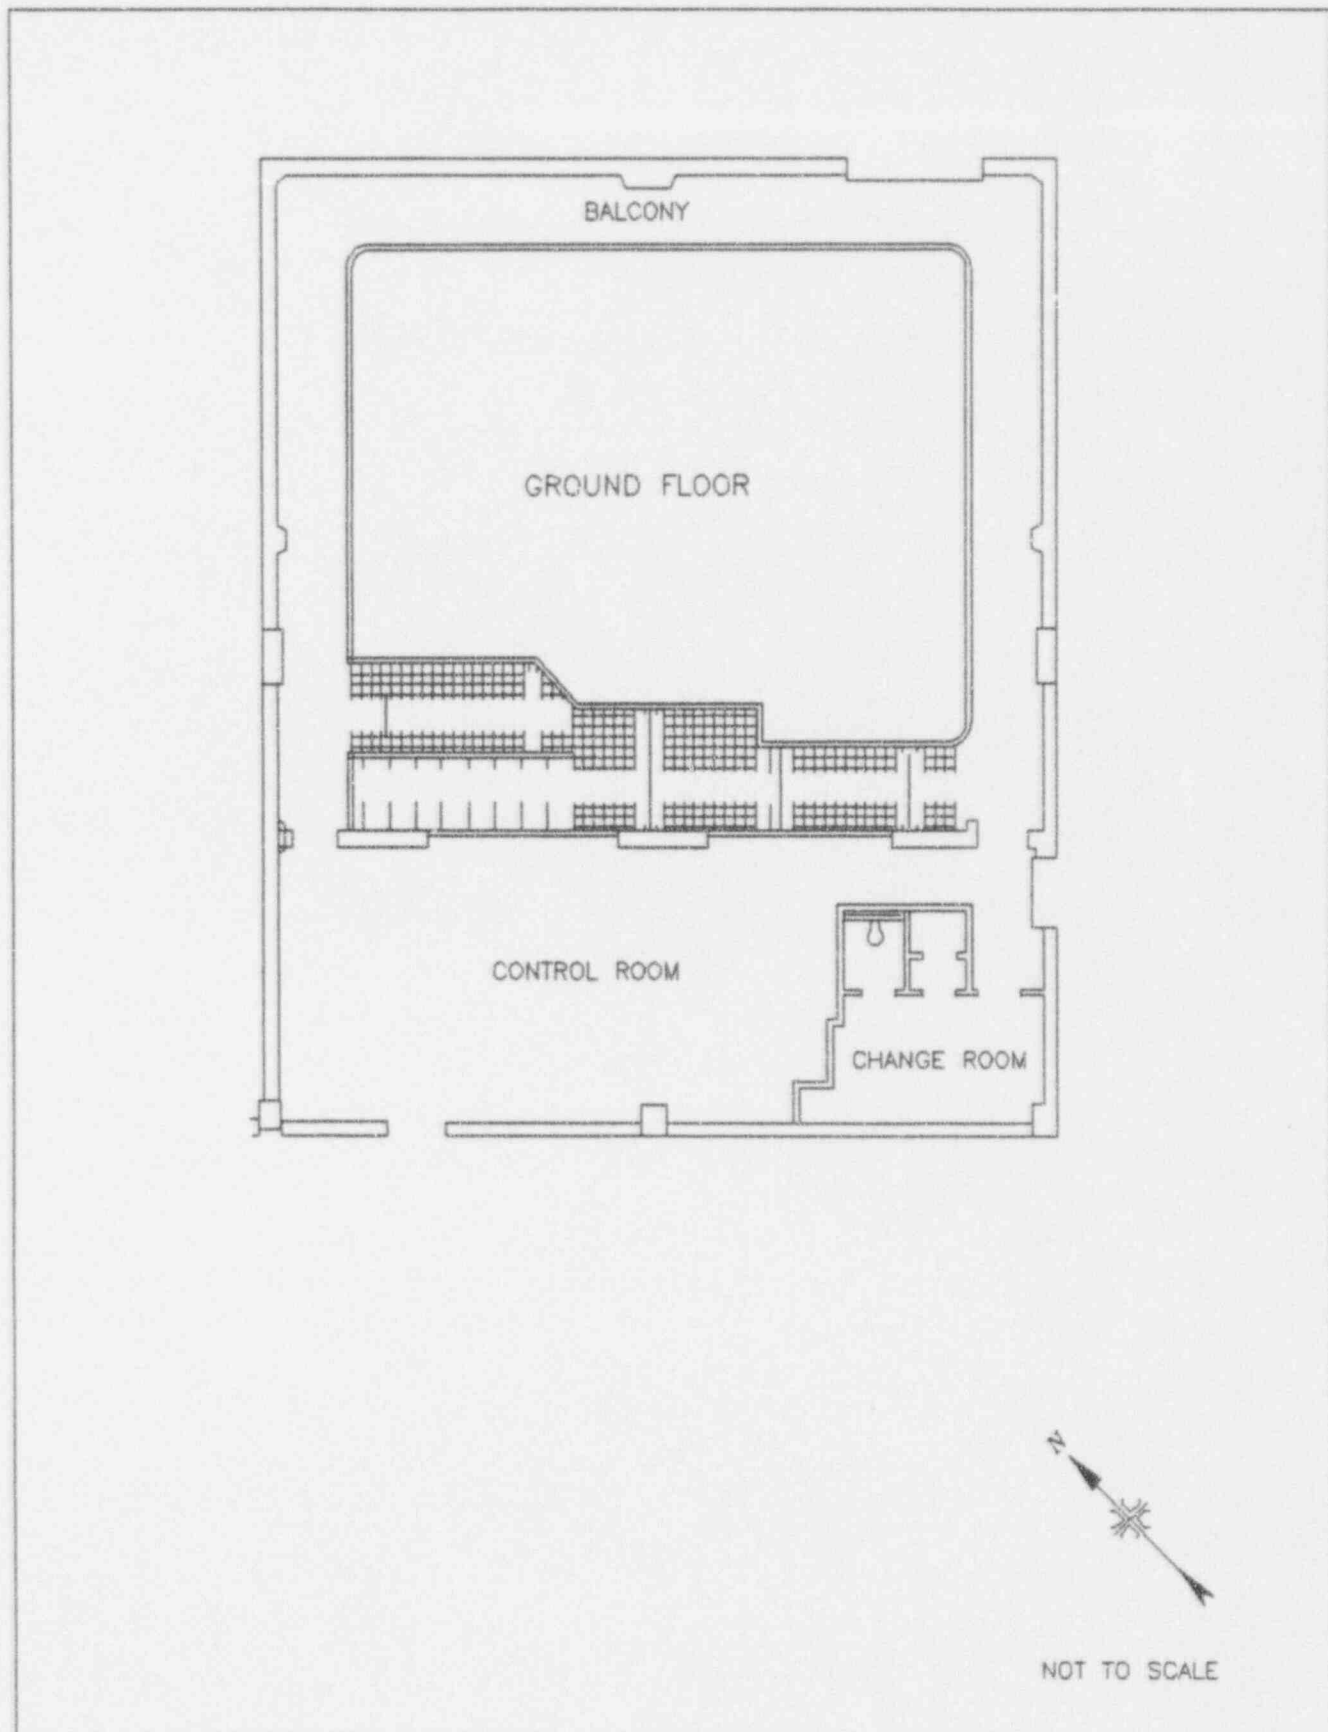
Boelter Reactor Facility, Plot Plan of Second Floor
